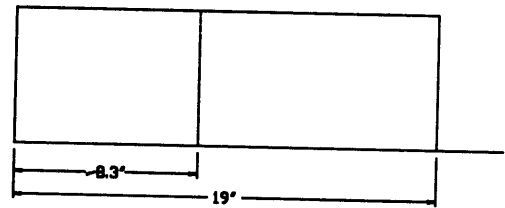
Wide Transversely Stiffened Specimen Construction Drawing
